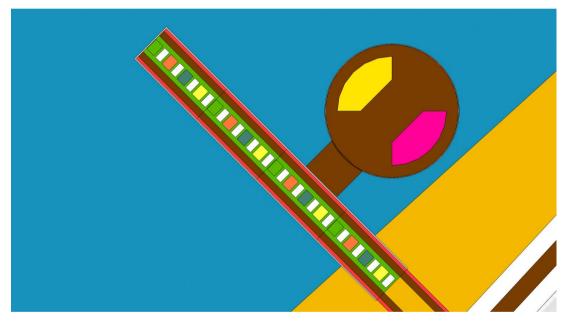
Concept 2, plan view of the top floor in relative to the beach
